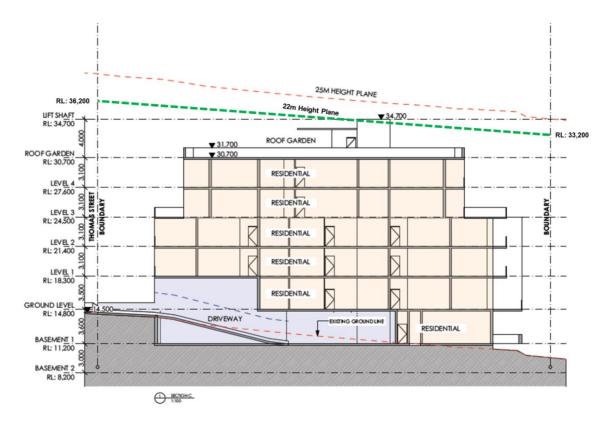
Section facing east from adjacent townhouse development (Source: PTI Architecture)
